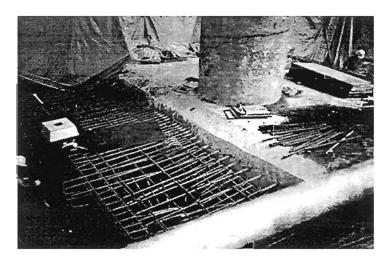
Repair works of a pile foundation of the elevated Portliner Railway in Kobe
